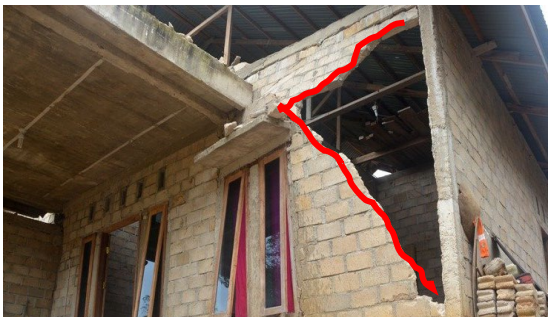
Damage and diagonal cracks in the walls of residential buildings due to the earthquake
